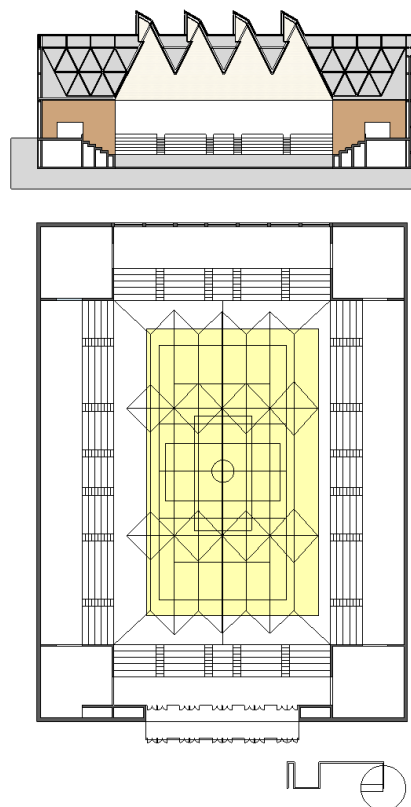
Floor plan and cross section (North - South) of the Centre Municipal Esportiu Vall d'Hebron - CEM VH building.
